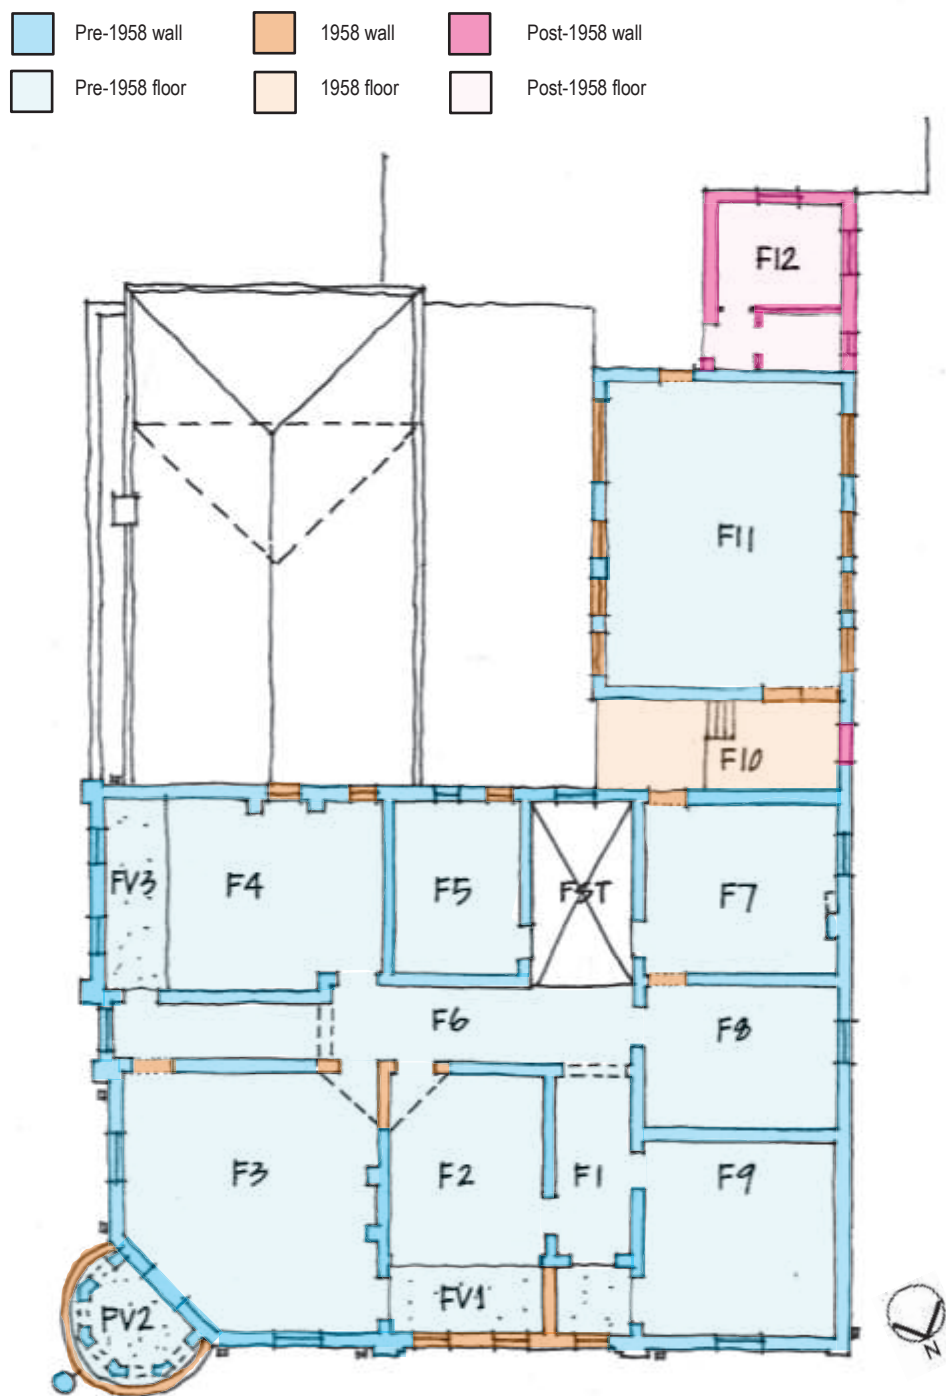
Diagrammatic first floor plan showing existing fabric from different eras
